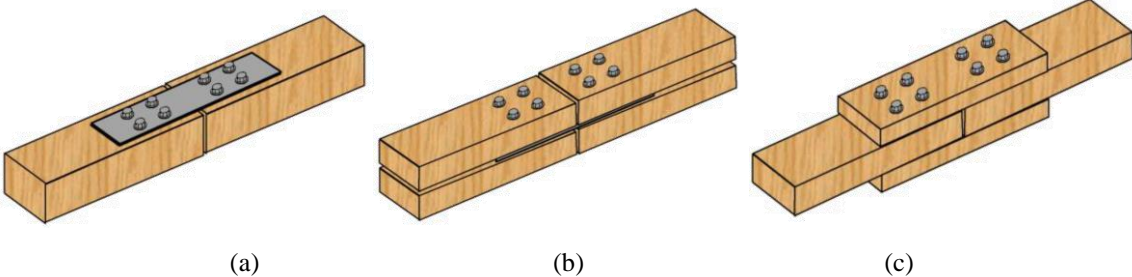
Double-shear timber connections: (a) steel-wood-steel connection; (b) wood-steel-wood connection; (c) wood-wood-wood connection, [4]
